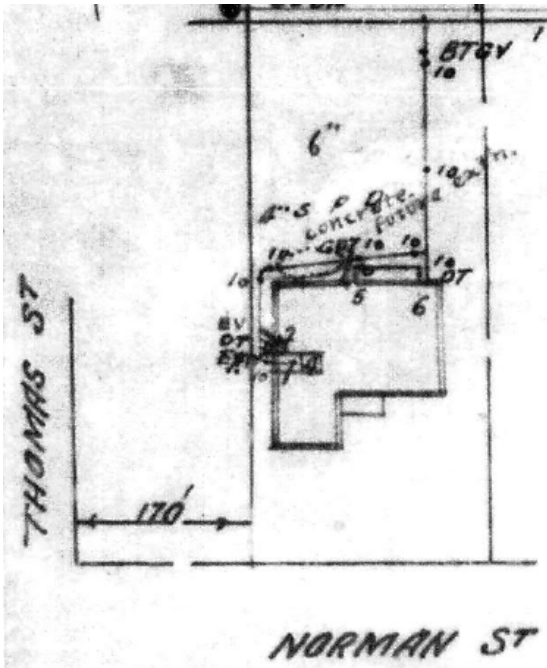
Footprint of the house, dated 1946, annotated with sewerage works (Source: Plan of Drainage No. 231800).
